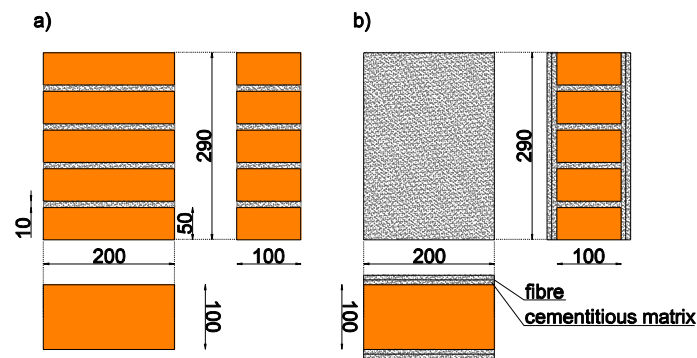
Graphic scheme (dimensions in mm) of the brick masonry panels, plan and elevation, a) unreinforced panel, b) reinforced panel.
